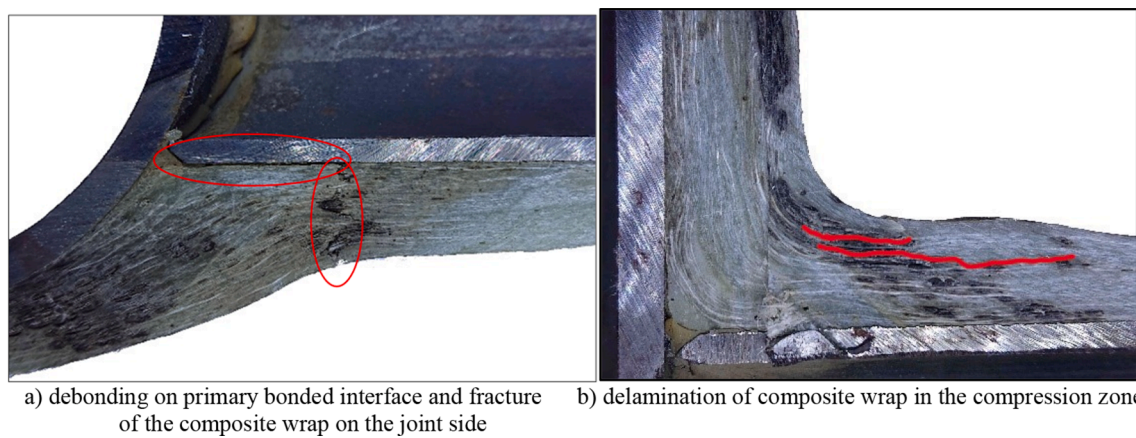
Cut-through 90° small-scale wrapped composite joint specimens loaded in bending.
